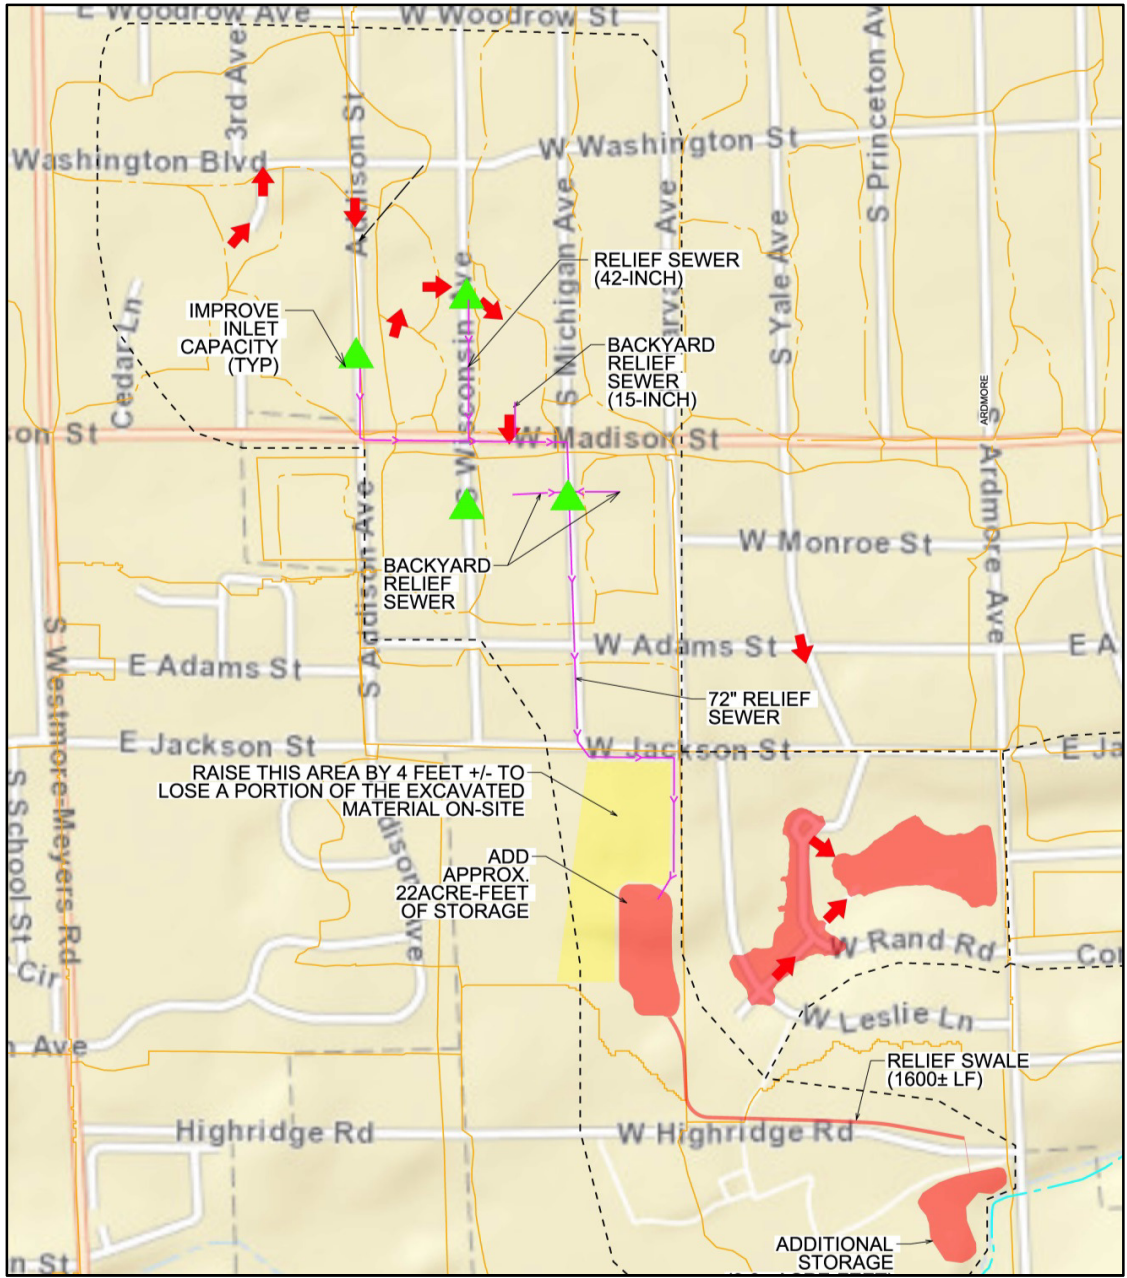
A – Proposed Improvements for Proposed Alternative 1c
